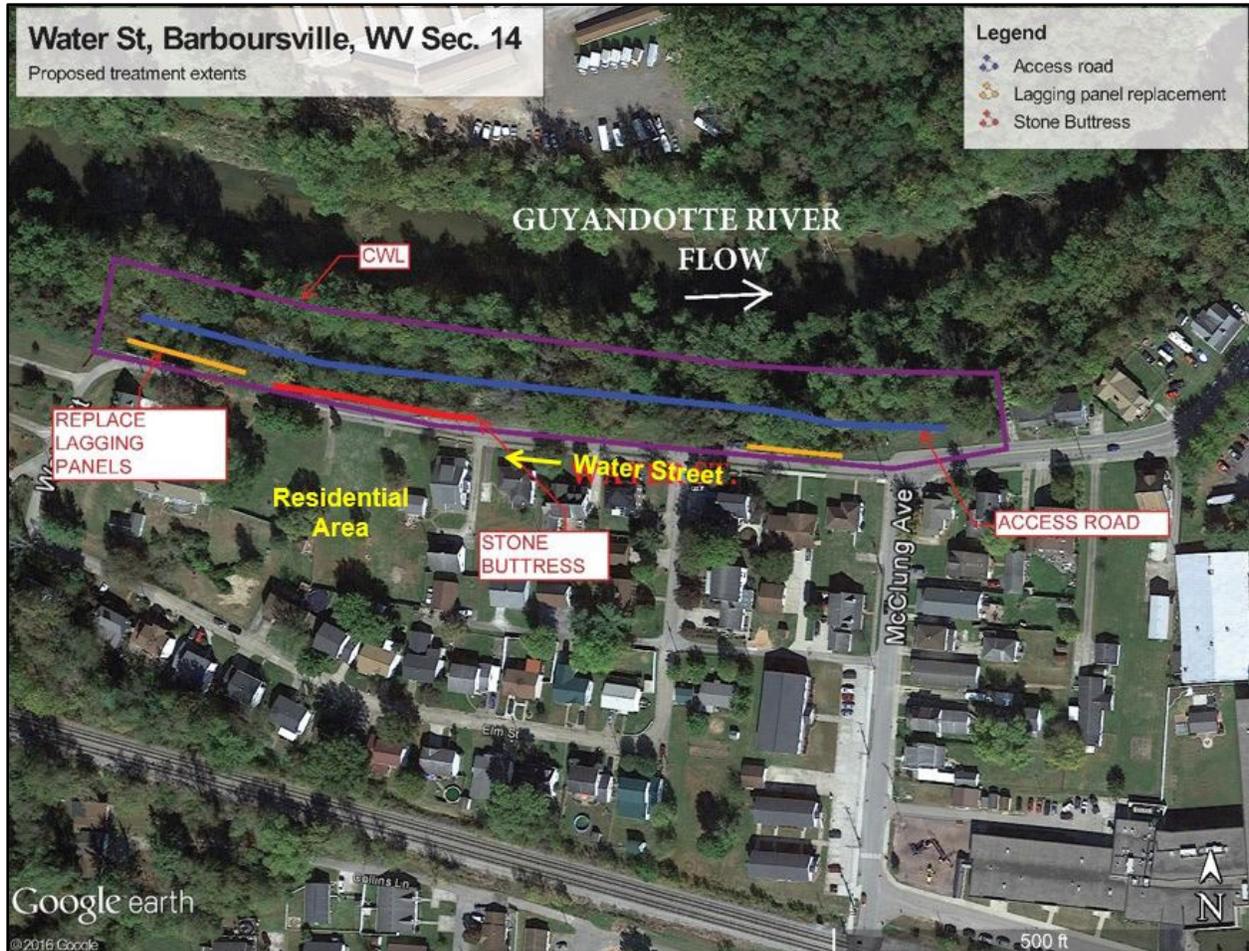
Recommended Plan as documented in the July 2017 Detailed Project Report
